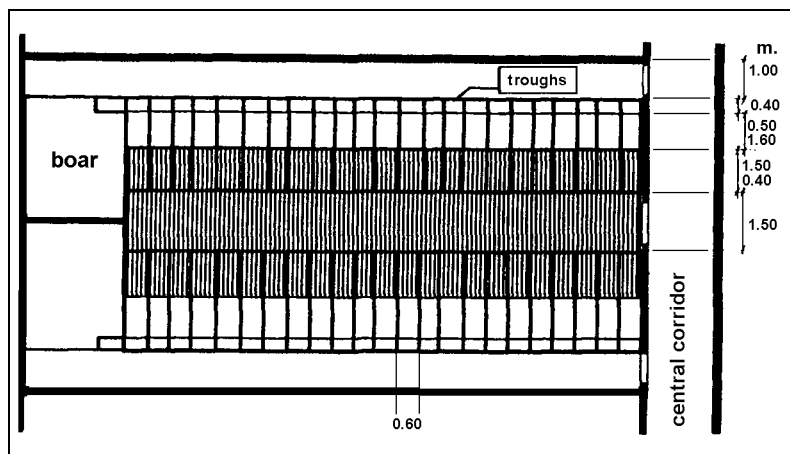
Schematic overview of a housing design for mating sows on a partly-slatted floor [31, EAAP, 1998]
